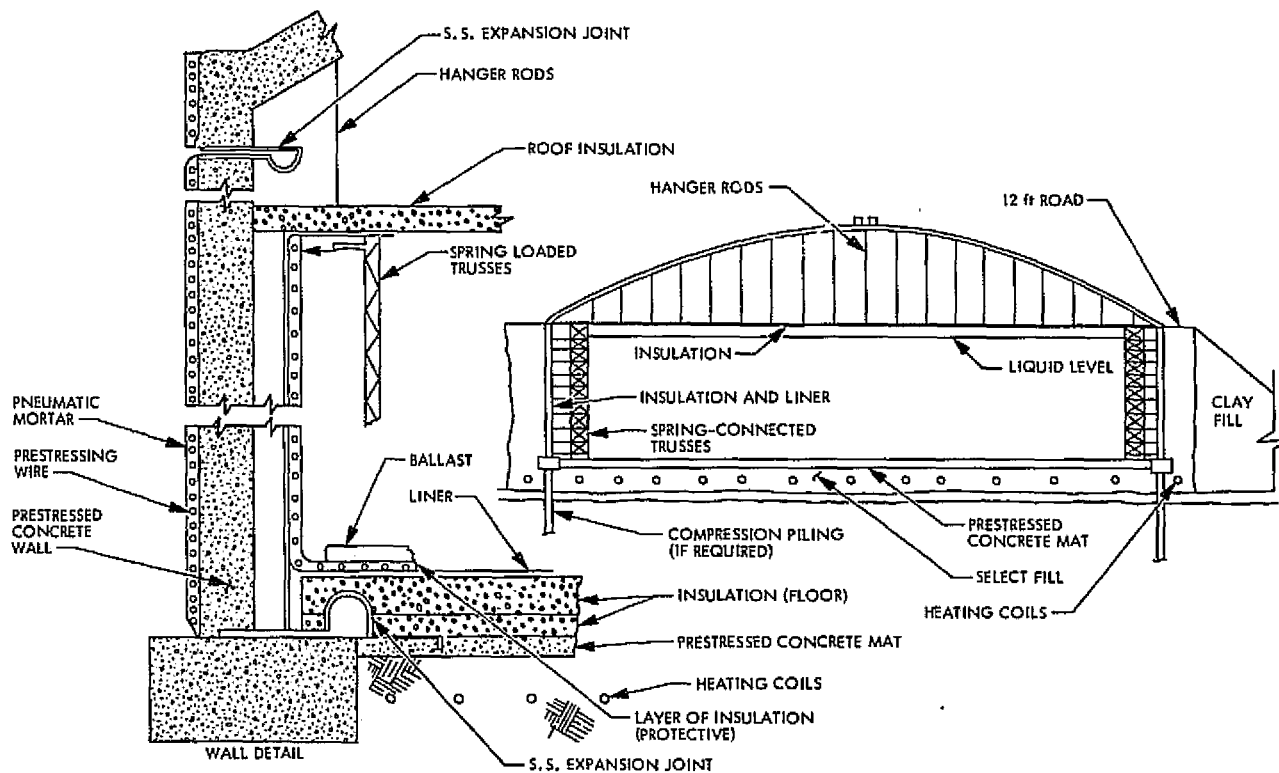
Internally Insulated Prestressed Concrete Tanks
